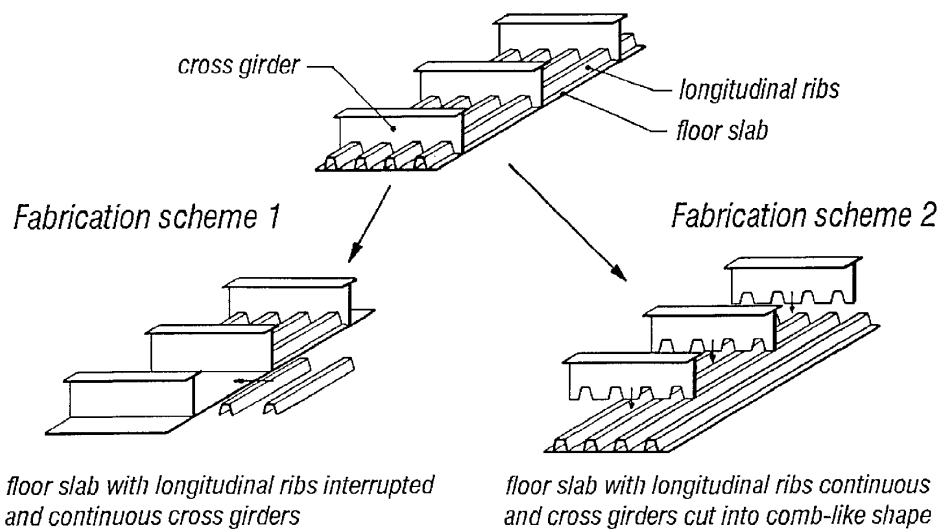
Fabrication of the floor slabs of light steel bridges with hollow longitudinal ribs.
